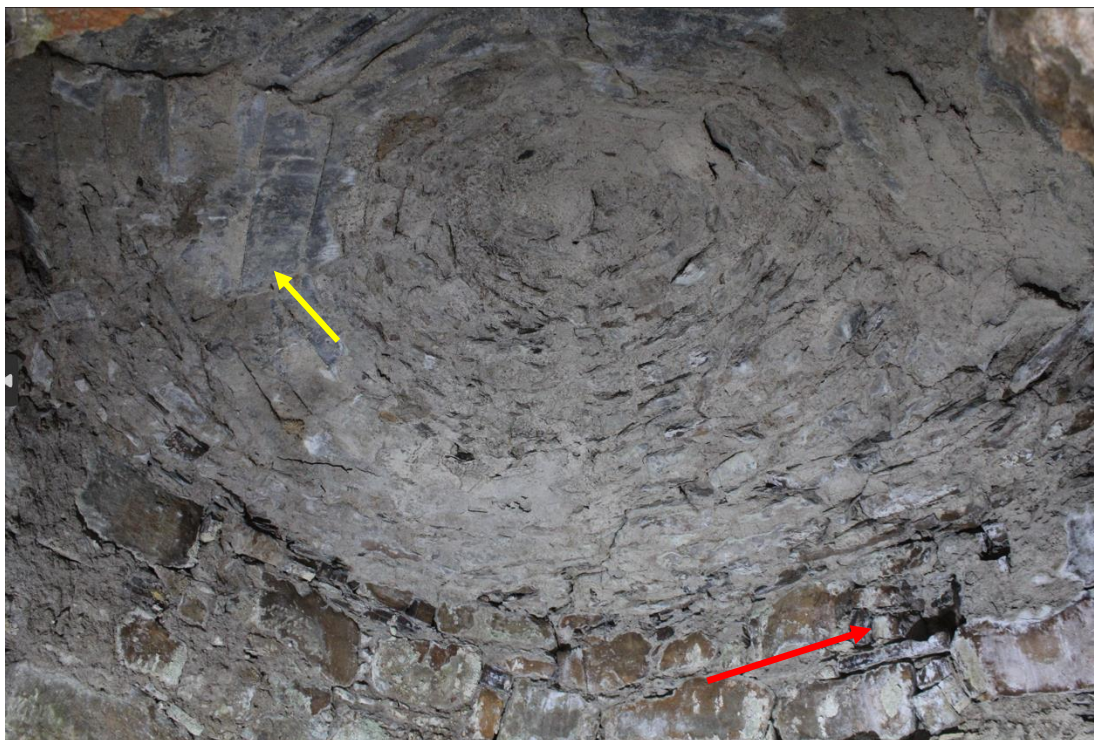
Southeast section of soffit within tower, note the modern repairs with sand and cement as evidenced by possible trowel marks (red arrow) and beam socket (yellow arrow).
